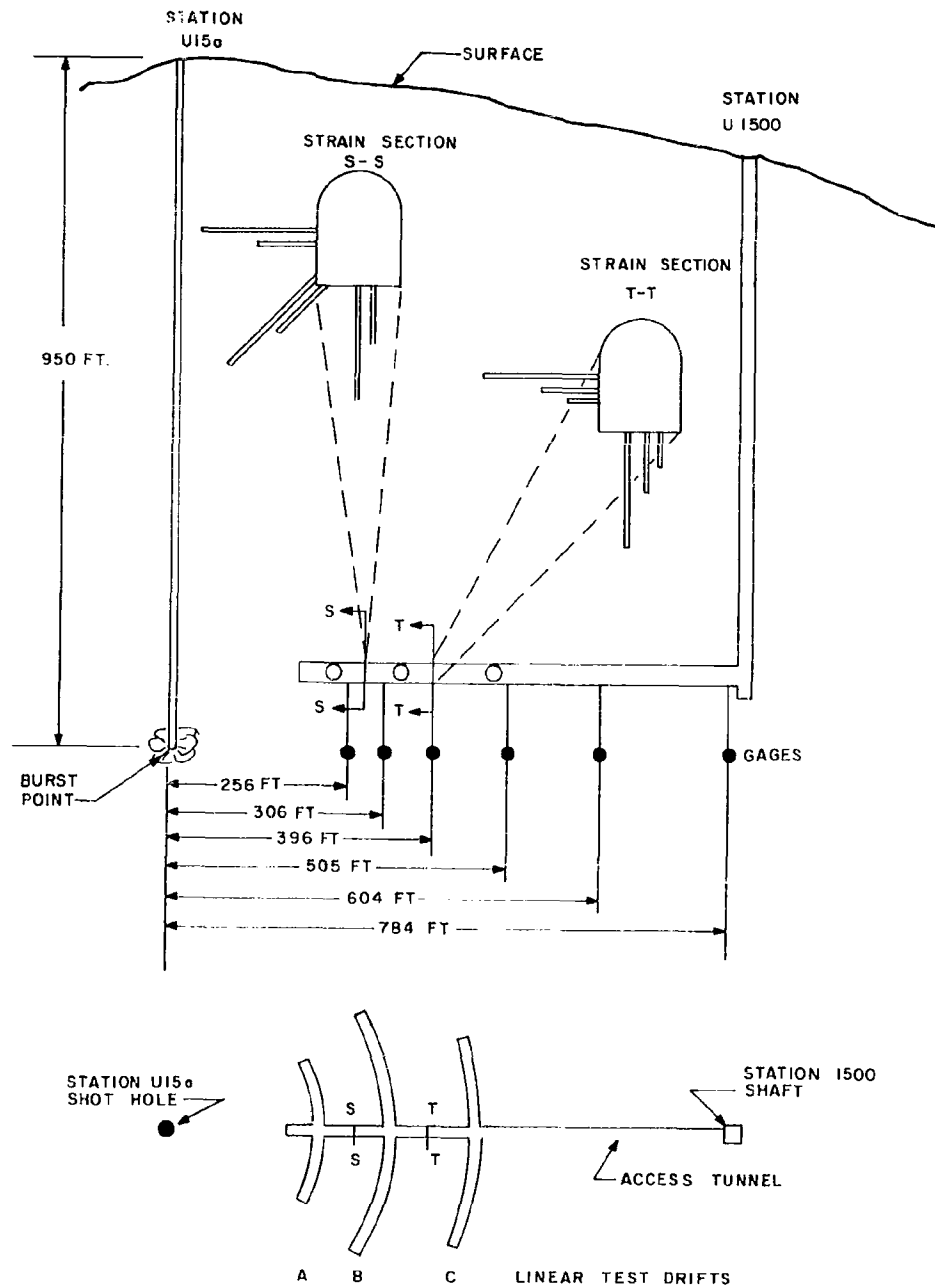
Site plan and elevation, Project 3.3 instrumentation.
